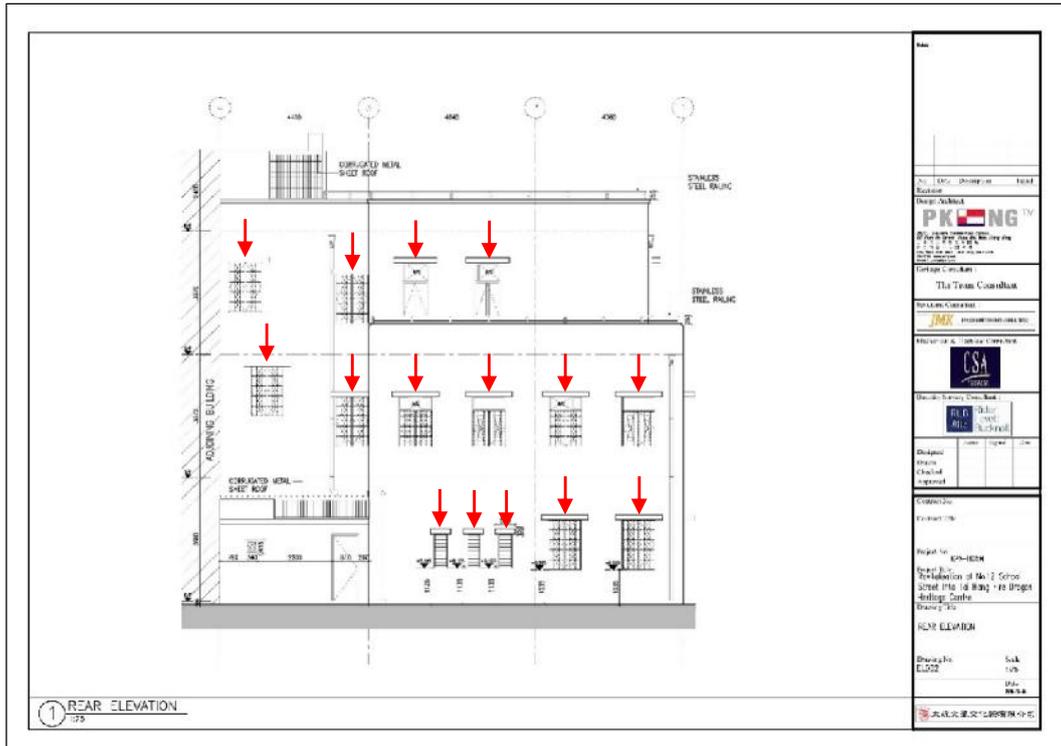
(drawing no. EL002) – First Lane (rear) elevation
